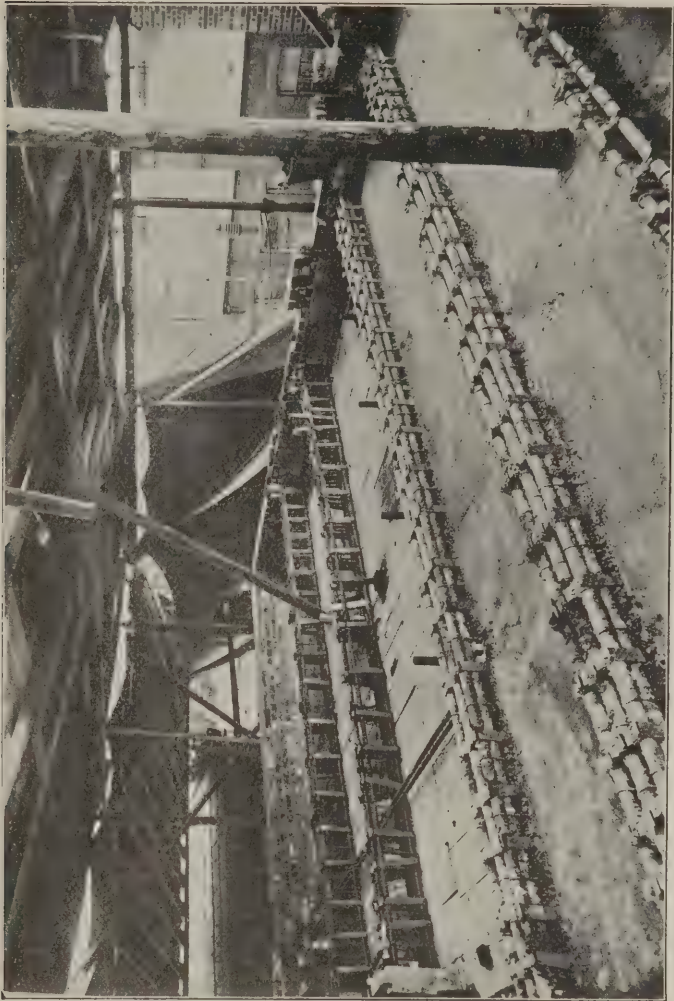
RECONSTRUCTION OF FLOOR OVER THE QUEEN'S BEDROOM AT SANDRINGHAM HOUSE AFTER THE FIRE OF 1903.
